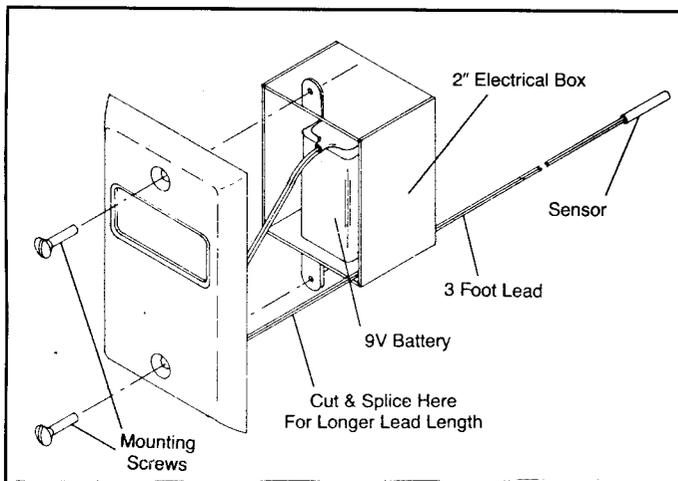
This is a factory drawing showing how the digital thermometer can be mounted on a standard house electrical wiring box.
